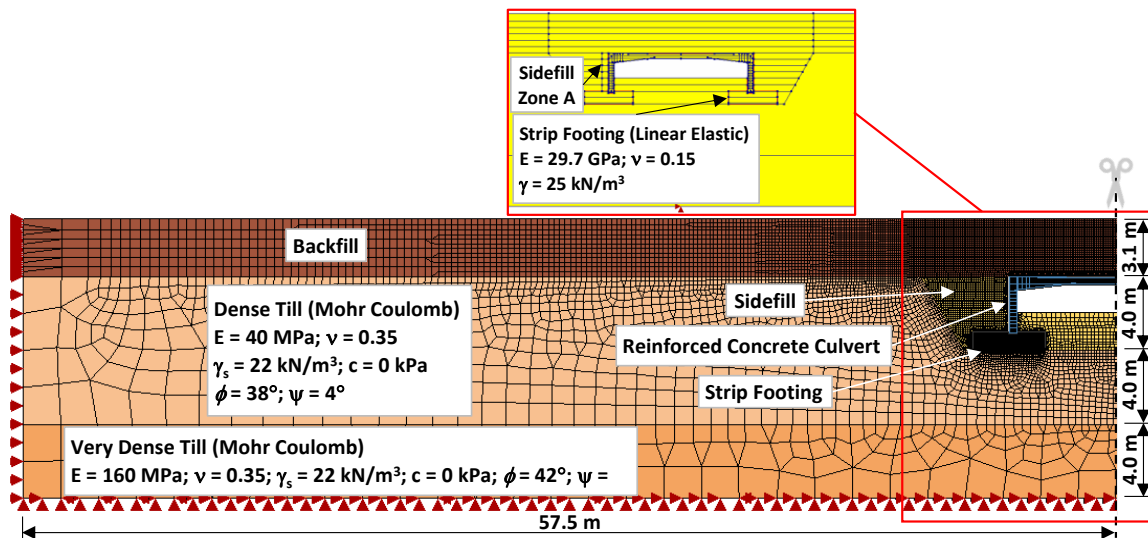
Geometry and meshing details of the Pickering culvert 2D FE model.
